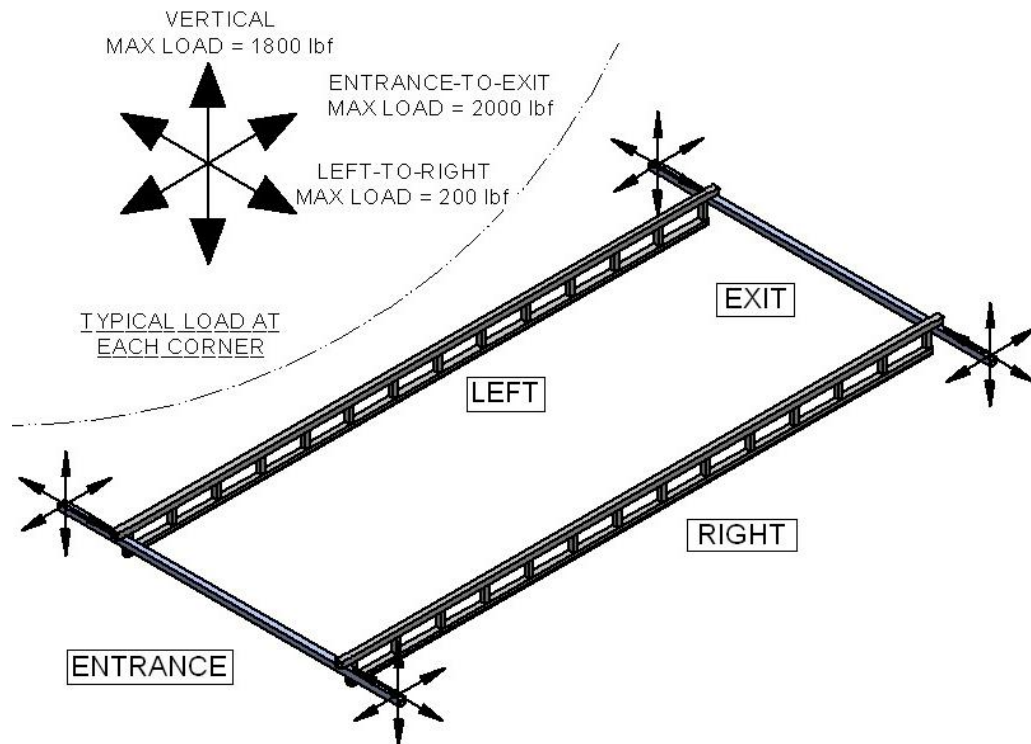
Maximum Forces Exerted on Building Walls, Frame Mounted to Site-Supplied Wall Beams.
